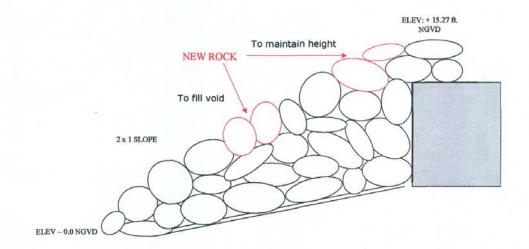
EXHIBIT III – REVETMENT WALL REPRESENTATIVE CROSS SECTION
